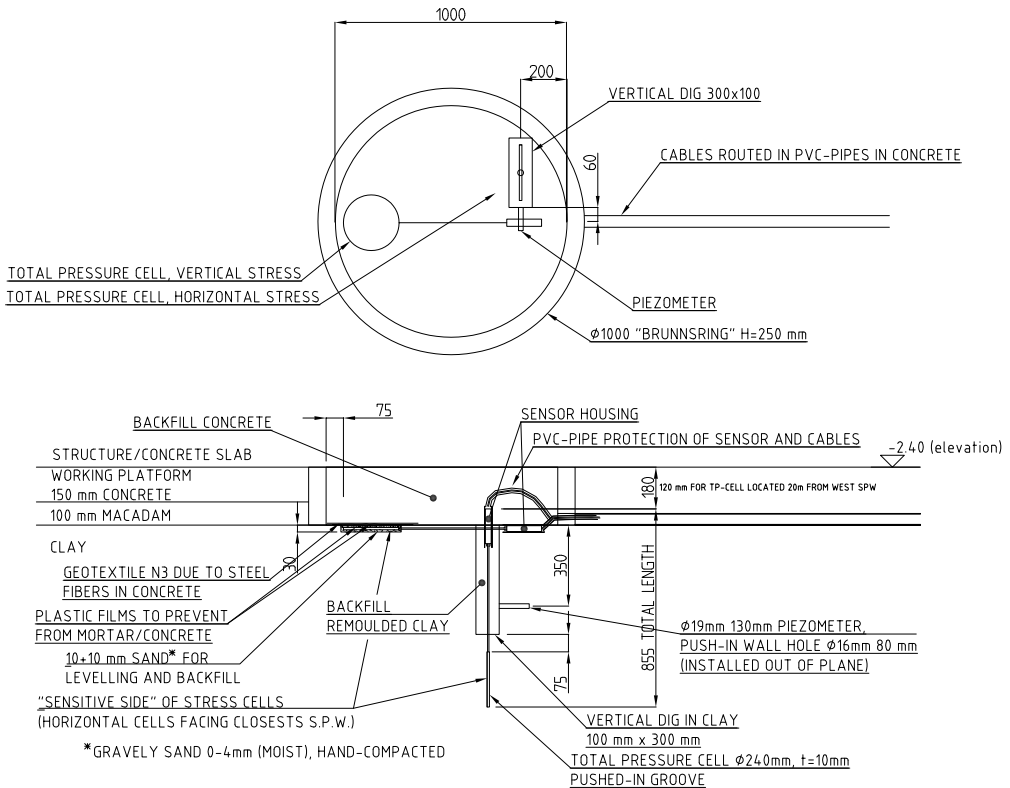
Detailed layout and cross section of the total earth pressure cells and piezometers installed in the clay under the permanent structure. Layout adopted at three locations in the instrumented cross section.
